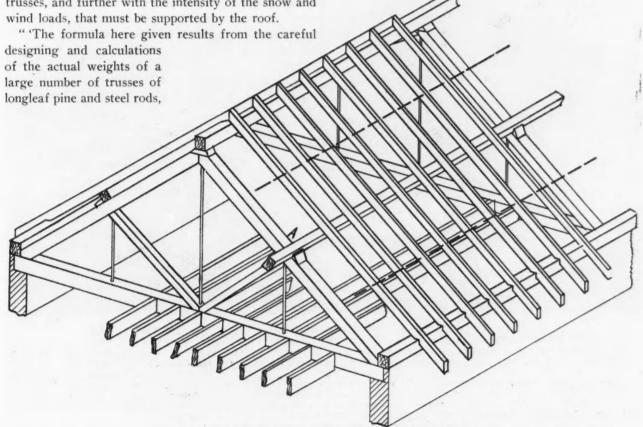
Method of Supporting Roof Loads at Joints of Truss.
